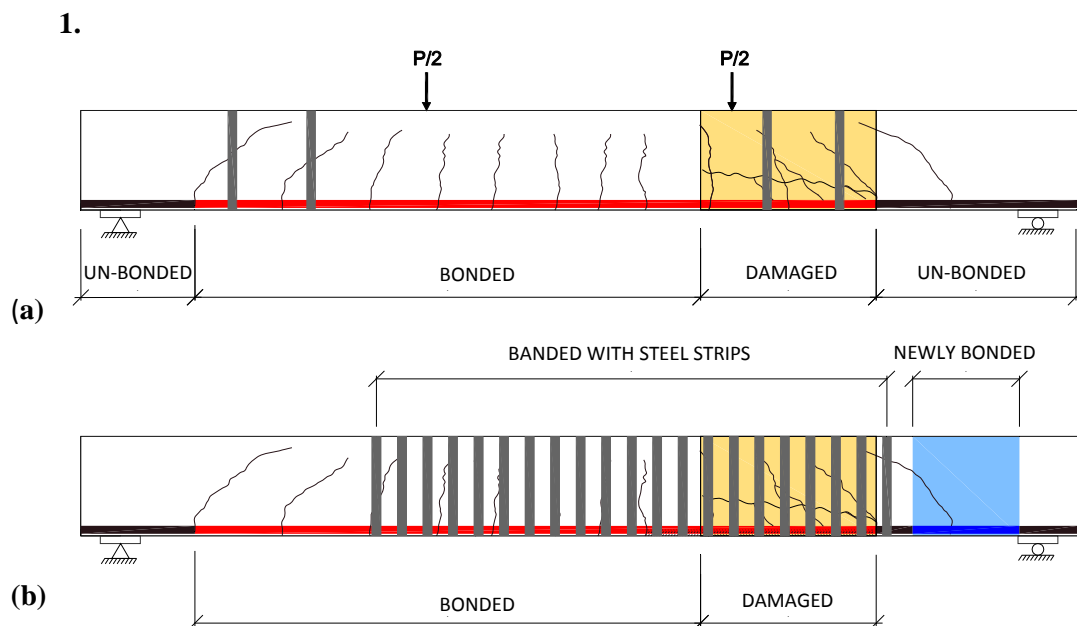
Repair the damaged beam (a) beam after damage, (b) Restore the damaged in region B beam by steel strips in region B and bond FRP to the concrete substrate in section A
